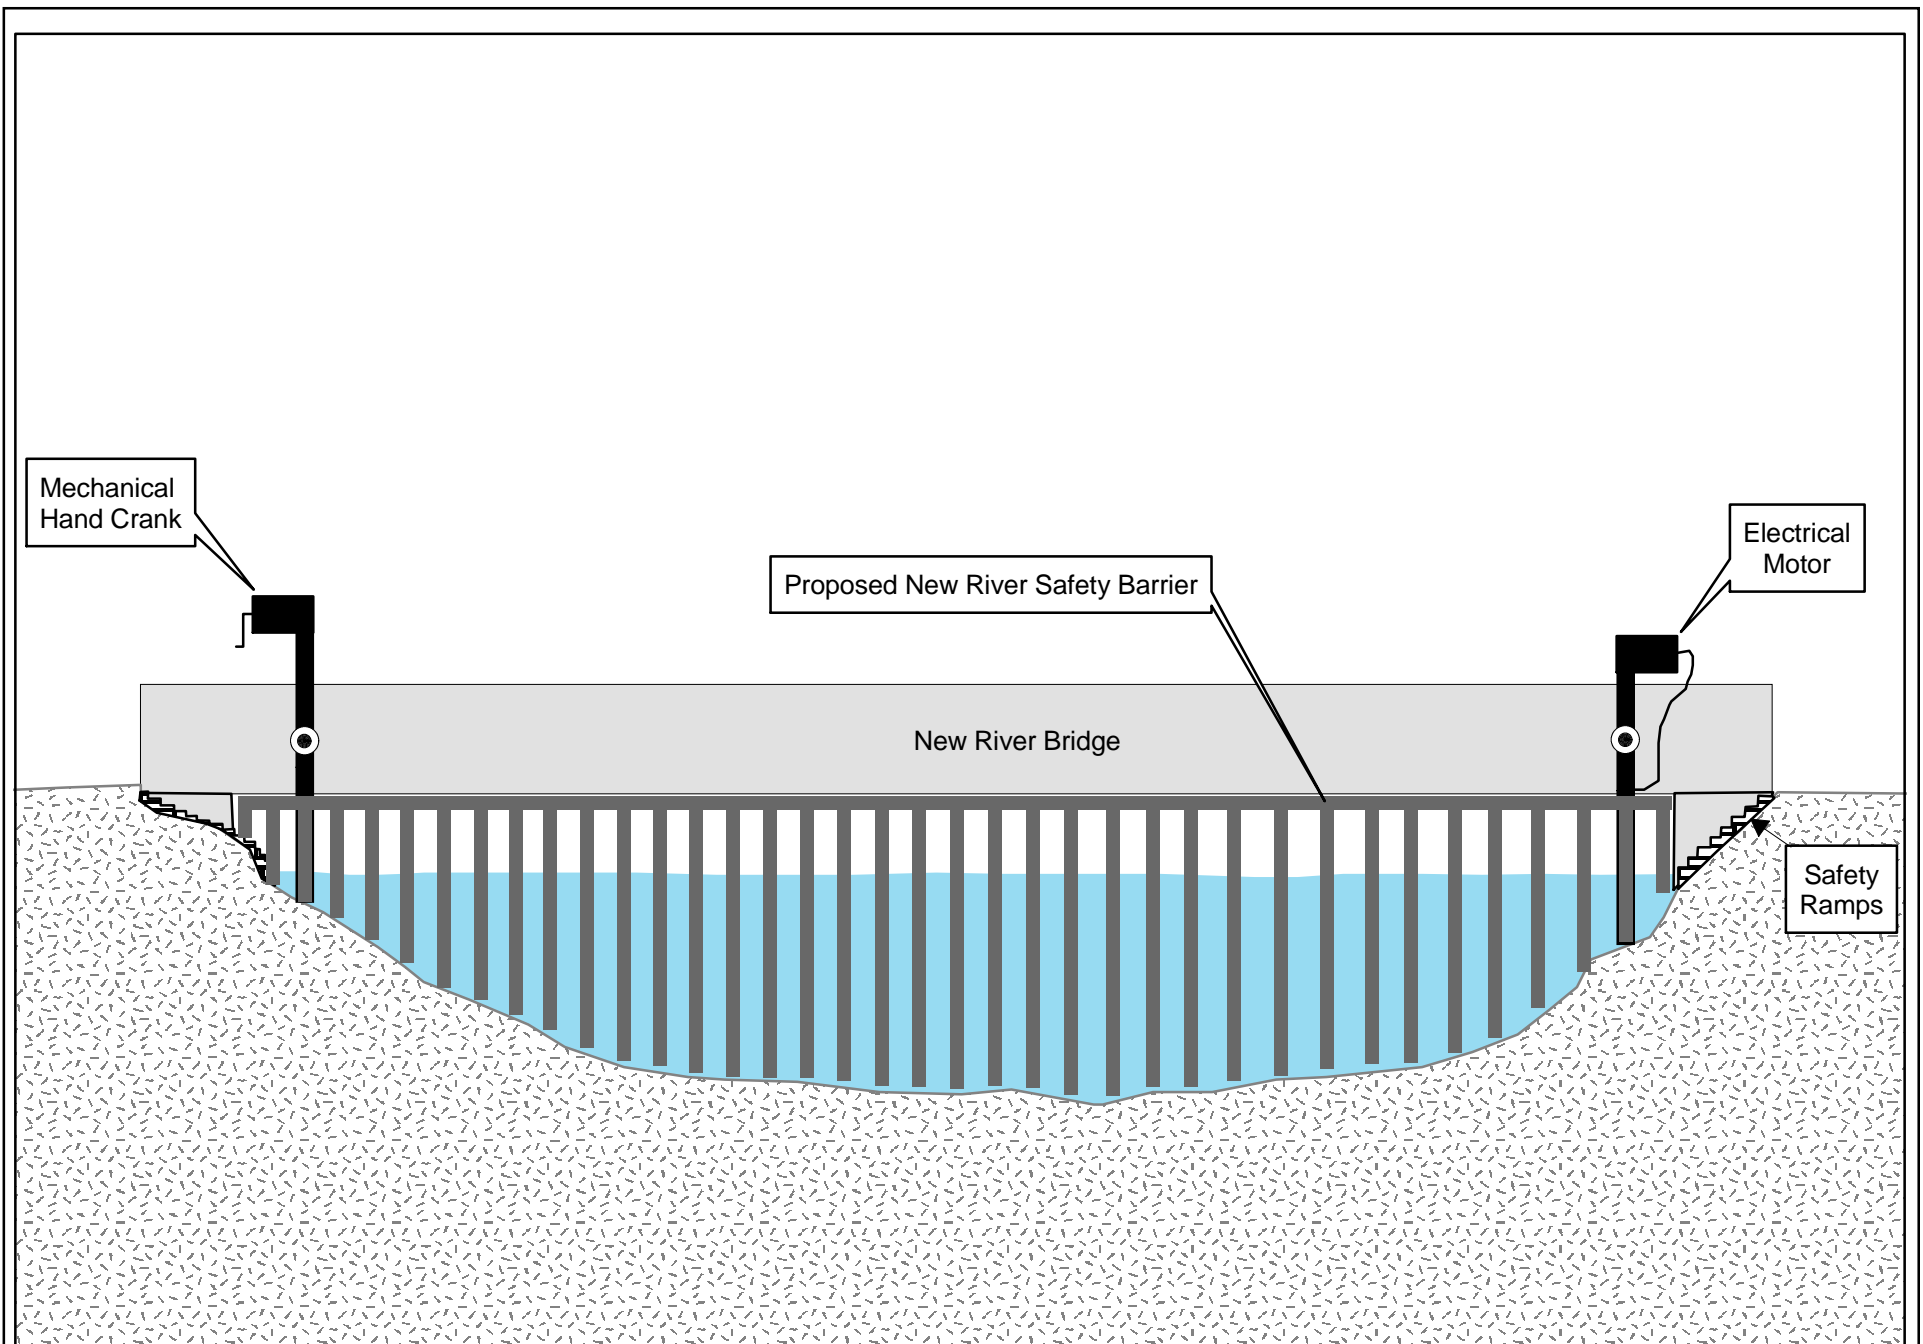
Proposed New River Safety Barrier Schematic in Lowered Position
